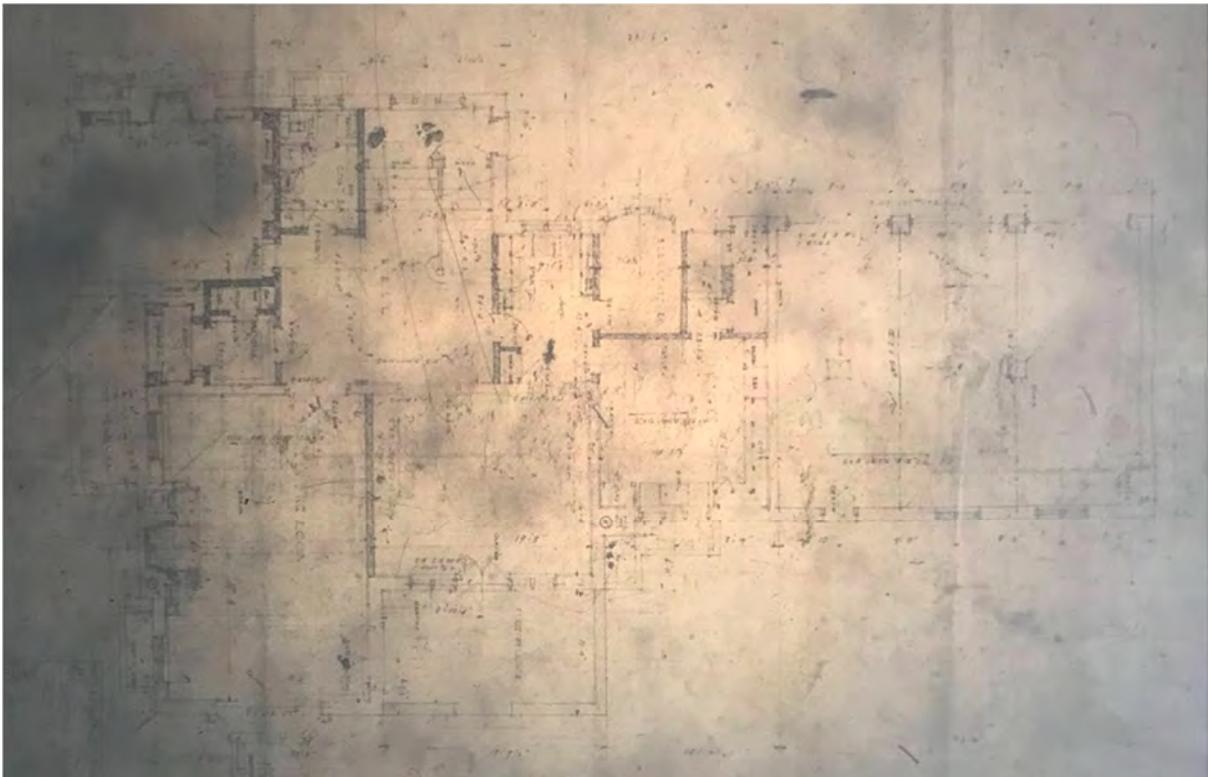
1934 architectural drawing by Douglas Kertland, showing the first floor plan including the extent of the flagstone garden terrace in the south garden. (Building Records)
